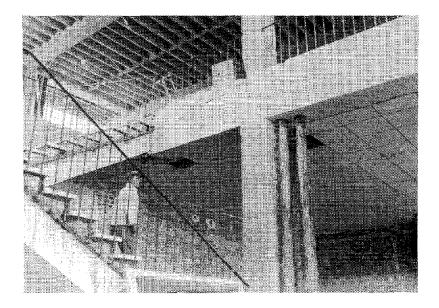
Girder overstressed by stairway, Exhibition Building, 1963 Skopje Earthquake. (Photo courtesy of Mete A. Sozen)
